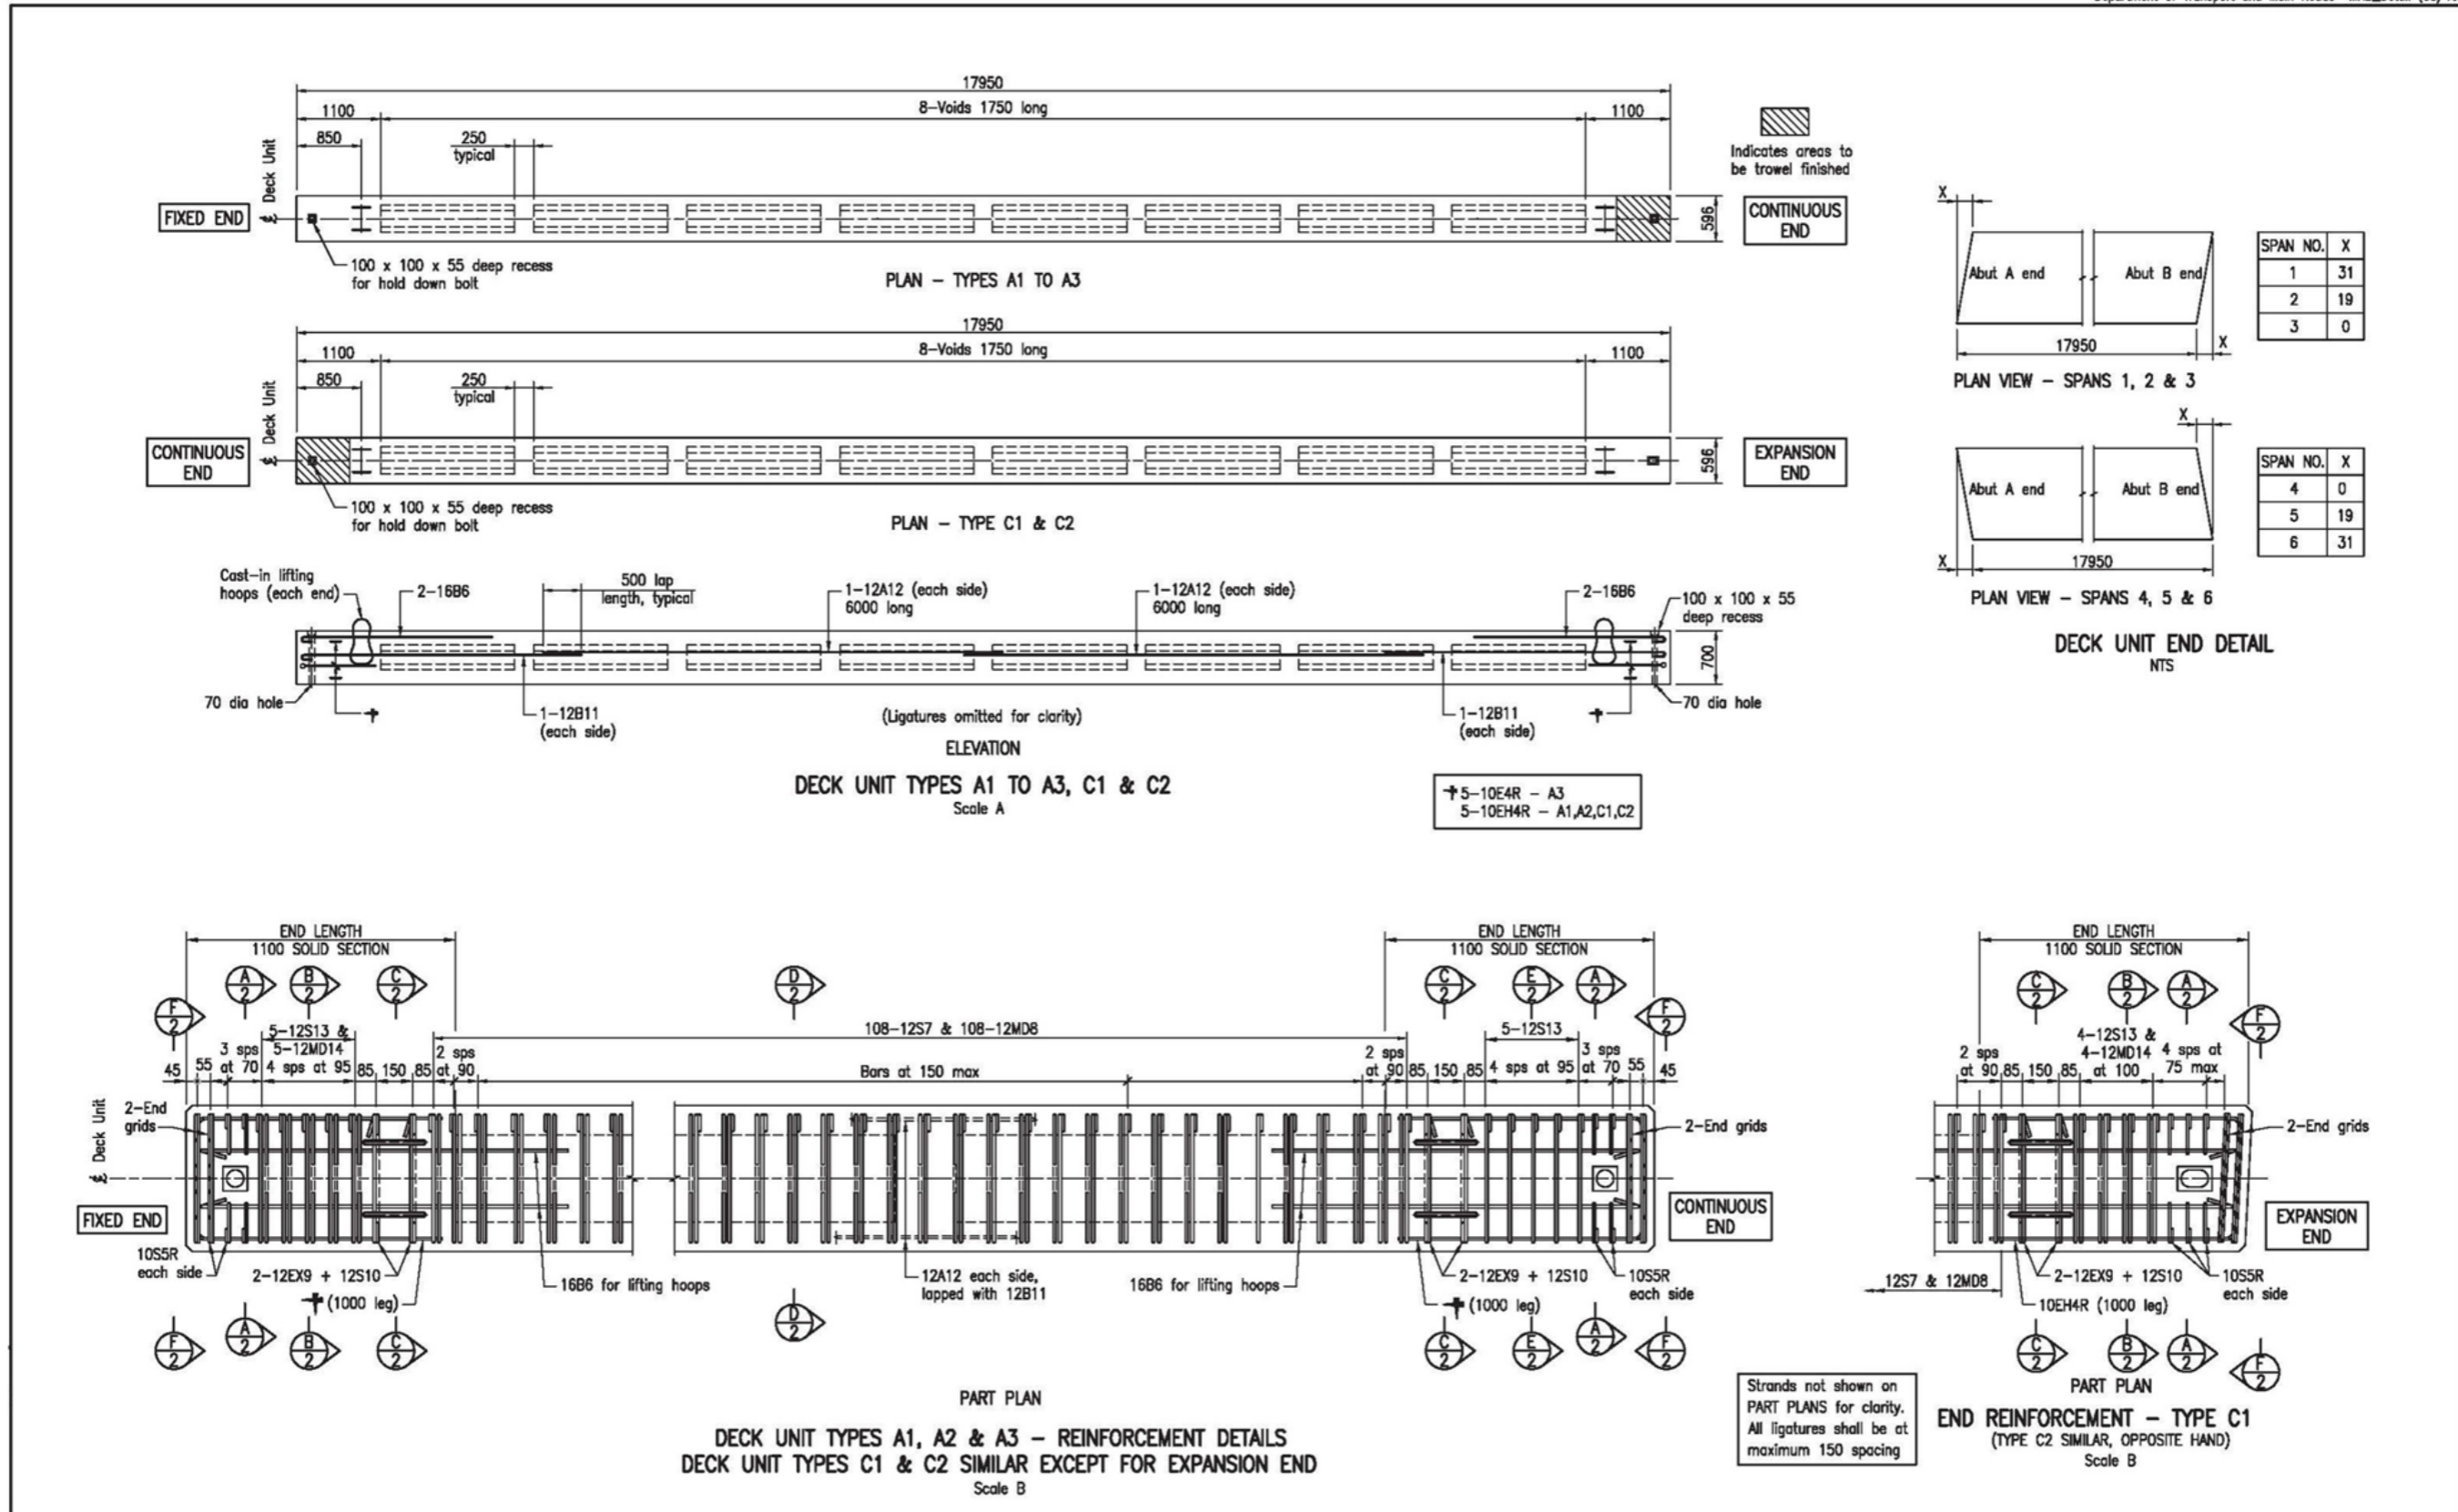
(h) - Example deck unit with reinforced concrete deck bridge drawings - Sheet 2
